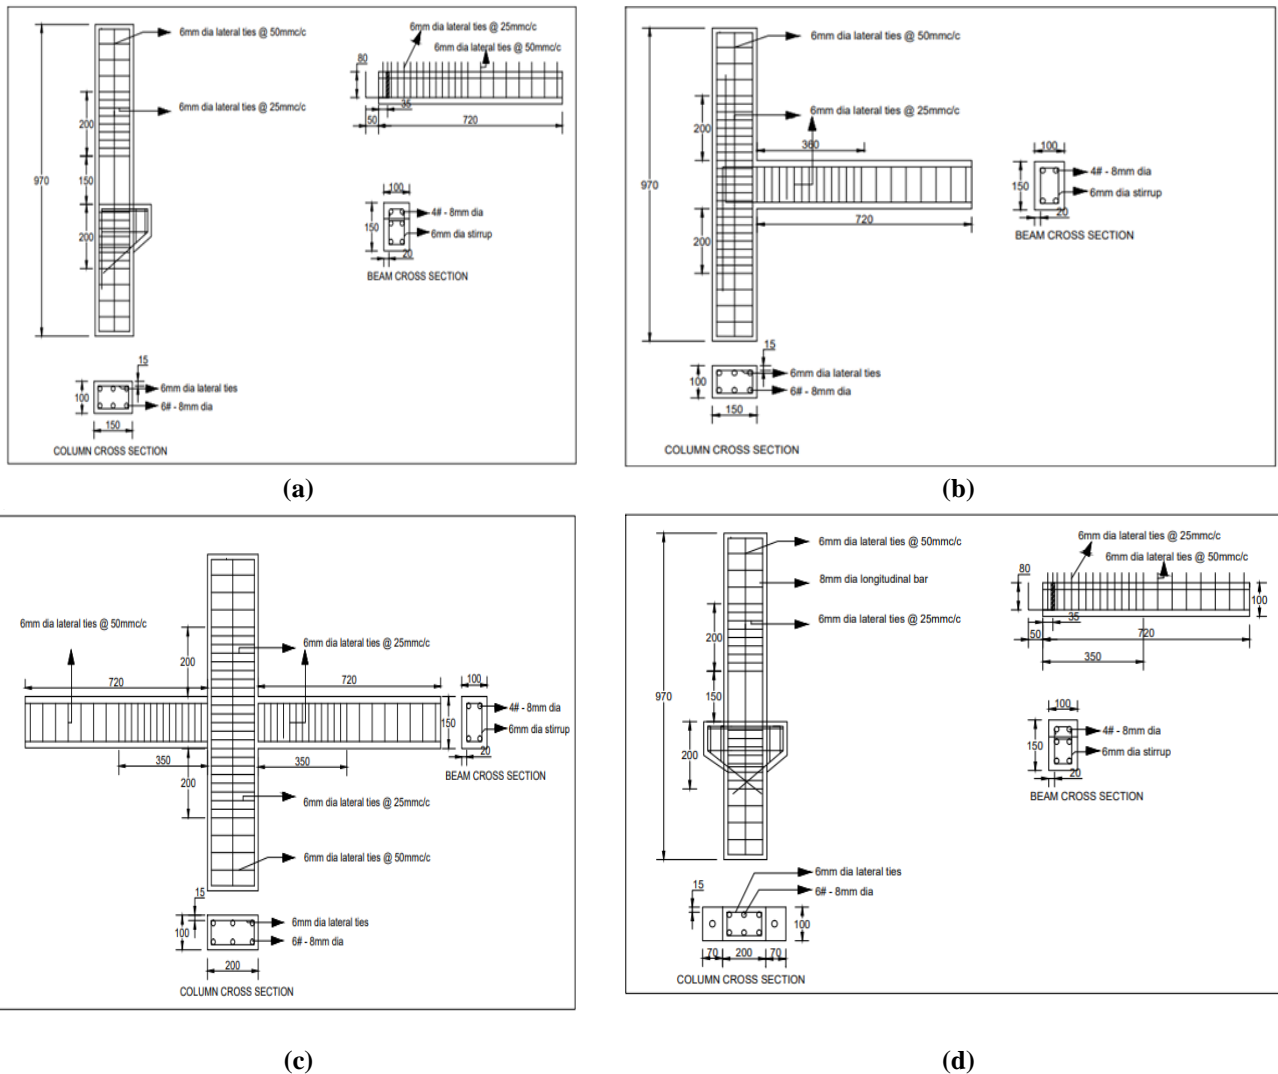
Reinforcement detailing of model specimens A) MBC-EJ specimen B) EBC-EJ specimen C) MBC-IJ specimen D) EBC-IJ specimen.
